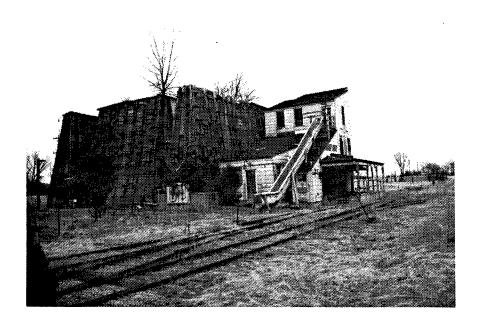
Building 6731-4: Barricaded Paste Breaker and Blender House. The main building area is separated by a double riveted barricade from the tram loading dock and the platform/elevator structure.
